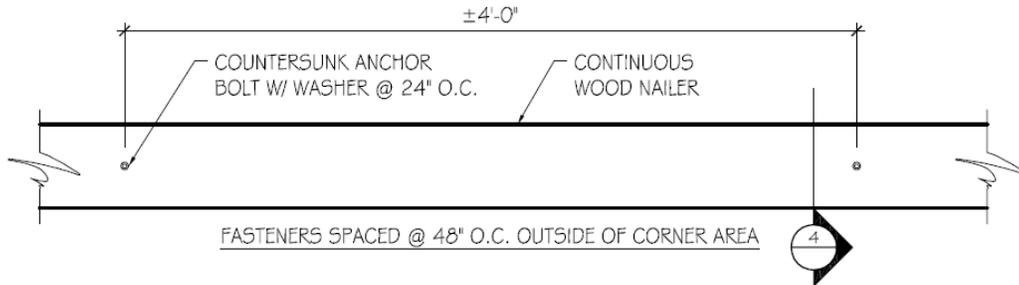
B - TYPICAL ROOF EDGE WOOD BLOCKING - THROUGH BOLT ANCHORAGE
